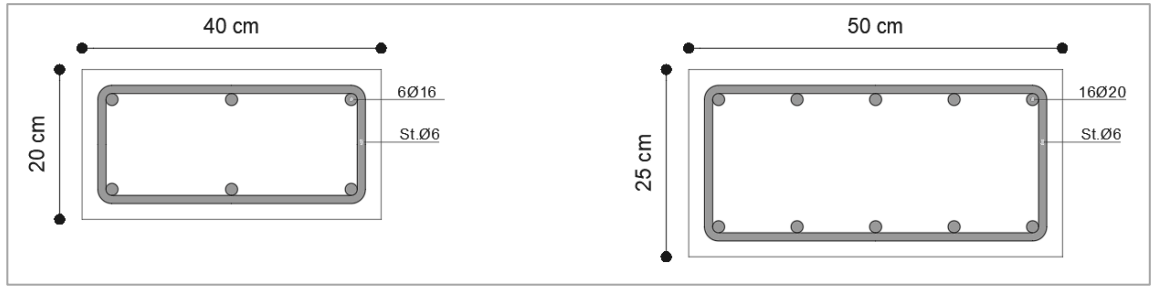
Column type “C - 4” (left) and beam (right) reinforcement details of E Template (Durrës) building
